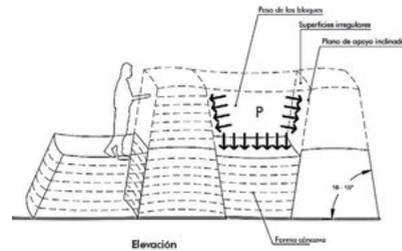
Diagram of forces favoring transverse restraint in walls (Source: Torres, 2021).
